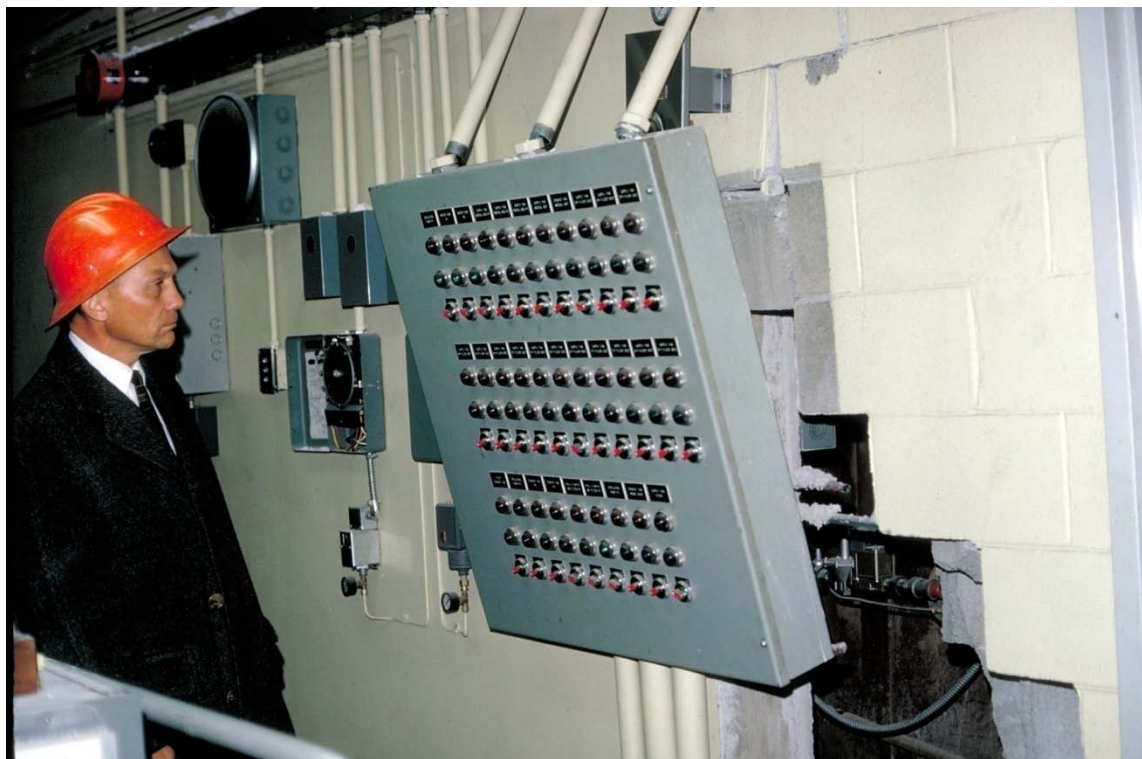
Dislodged panel board due to failure of hollow concrete block partition wall in the 1964 magnitude-9.2 Anchorage, Alaska earthquake (Photo courtesy of PEER Steinbrugge Collection, No. S2144).
